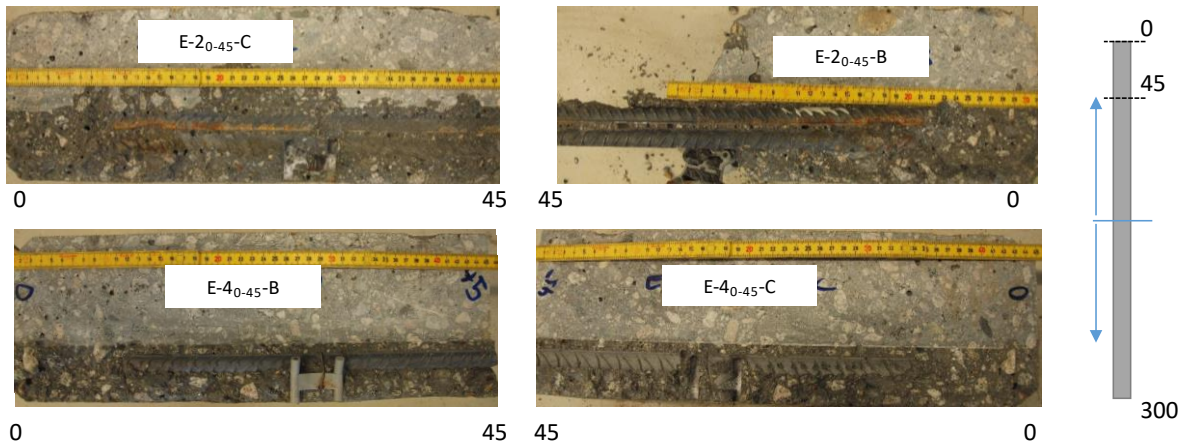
Steel-concrete interface of beam E section 0 to 45 cm. Superficial rust.
